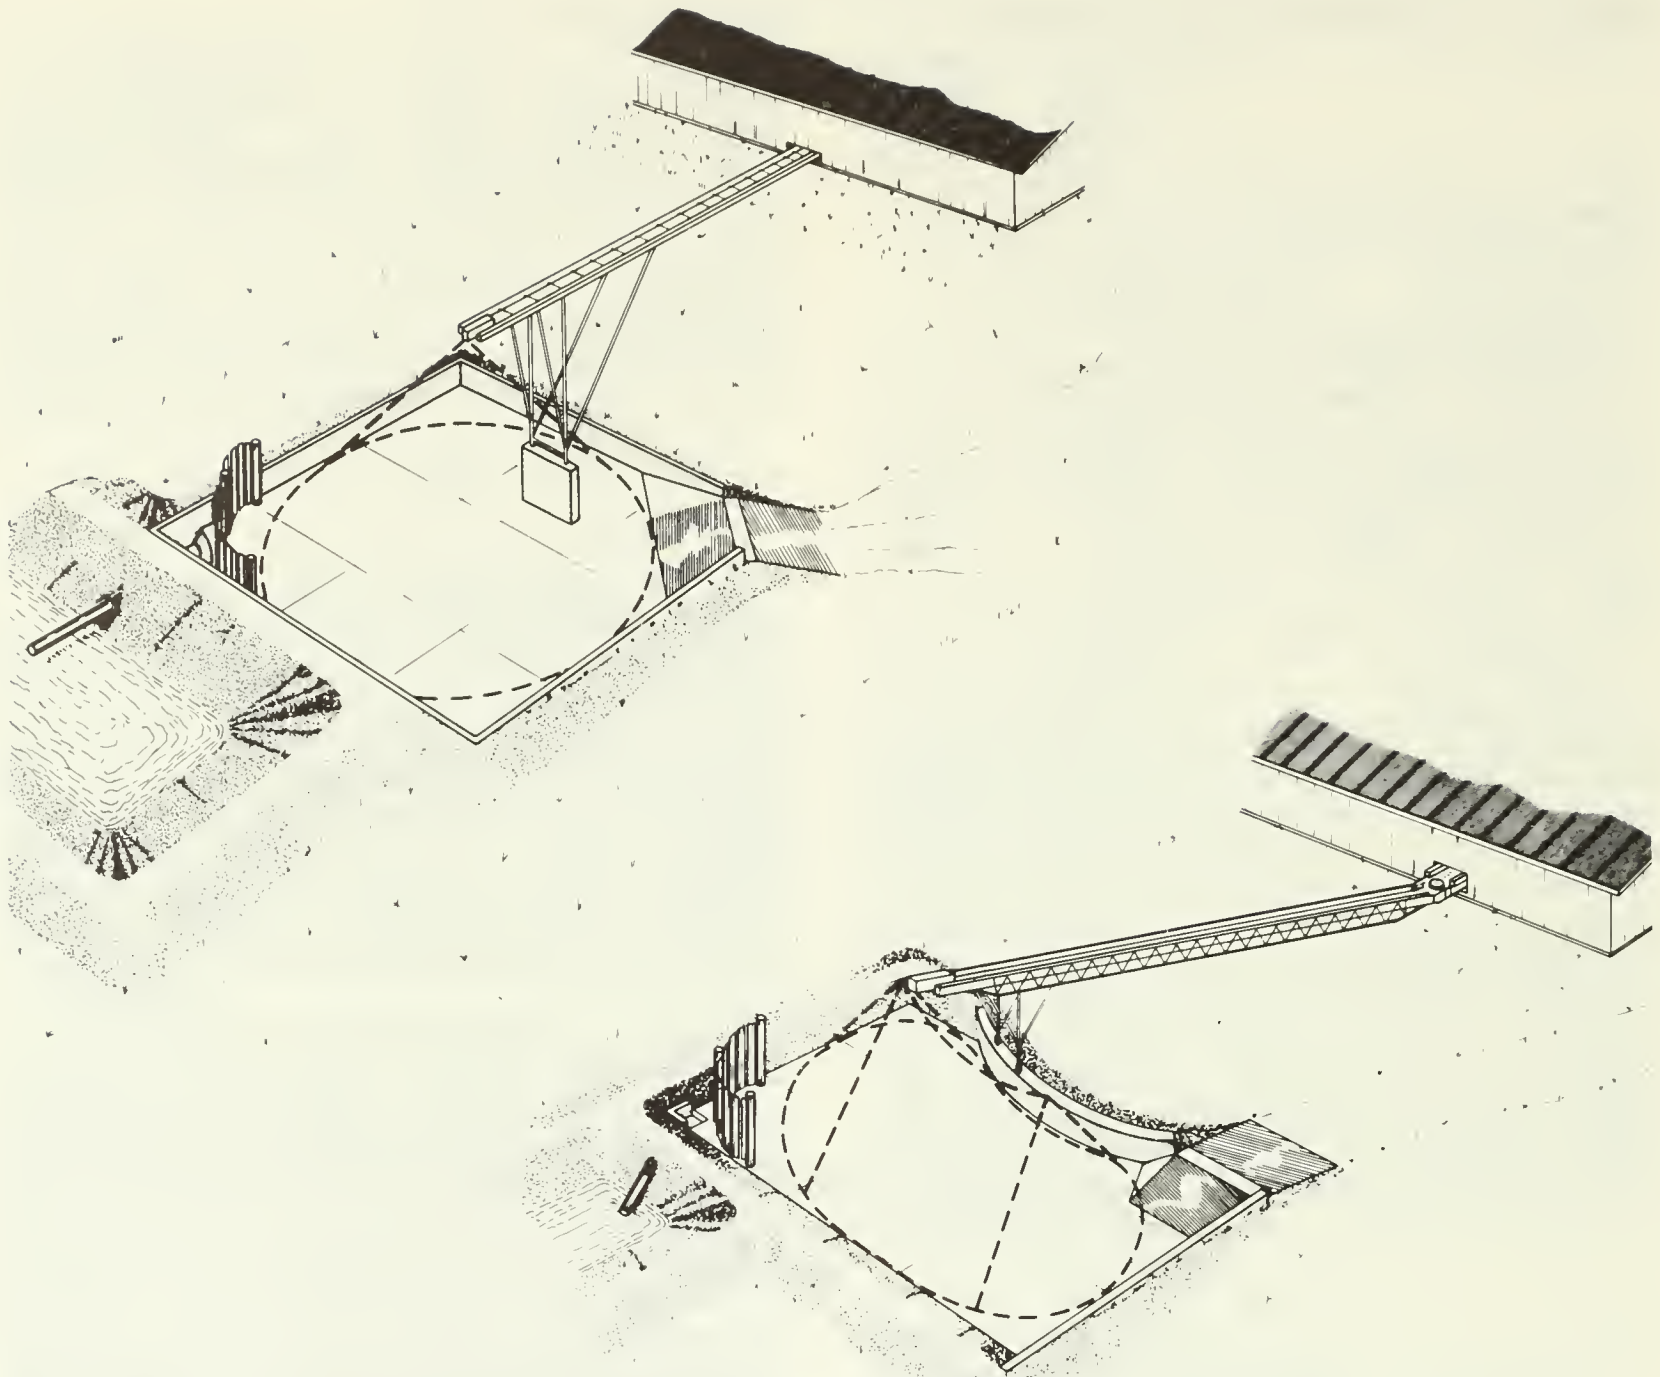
Curbed storage slab for stacked manure (CPS plan M-2703)
